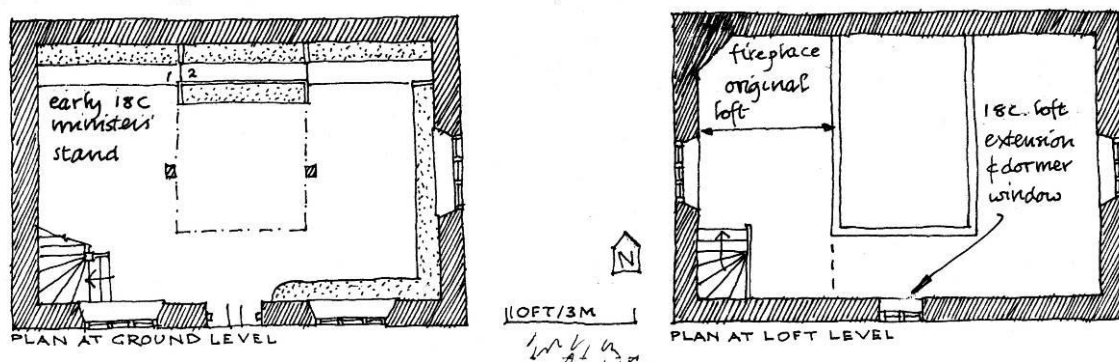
Ground and loft floor plan of the meeting house as reconstructed by Butler (north to the top; not to scale) (Butler (1999), vol. II, p.492)
